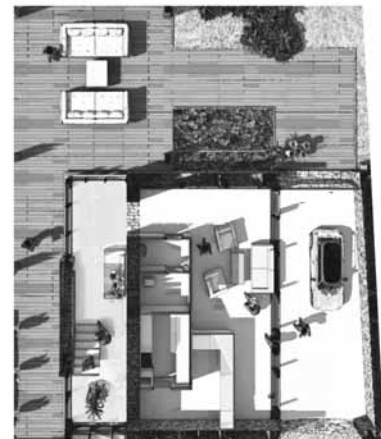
perspective view of final concept and floor plans (Source: Barbara Uherek-Bradecka, Tomasz Bradecki)
